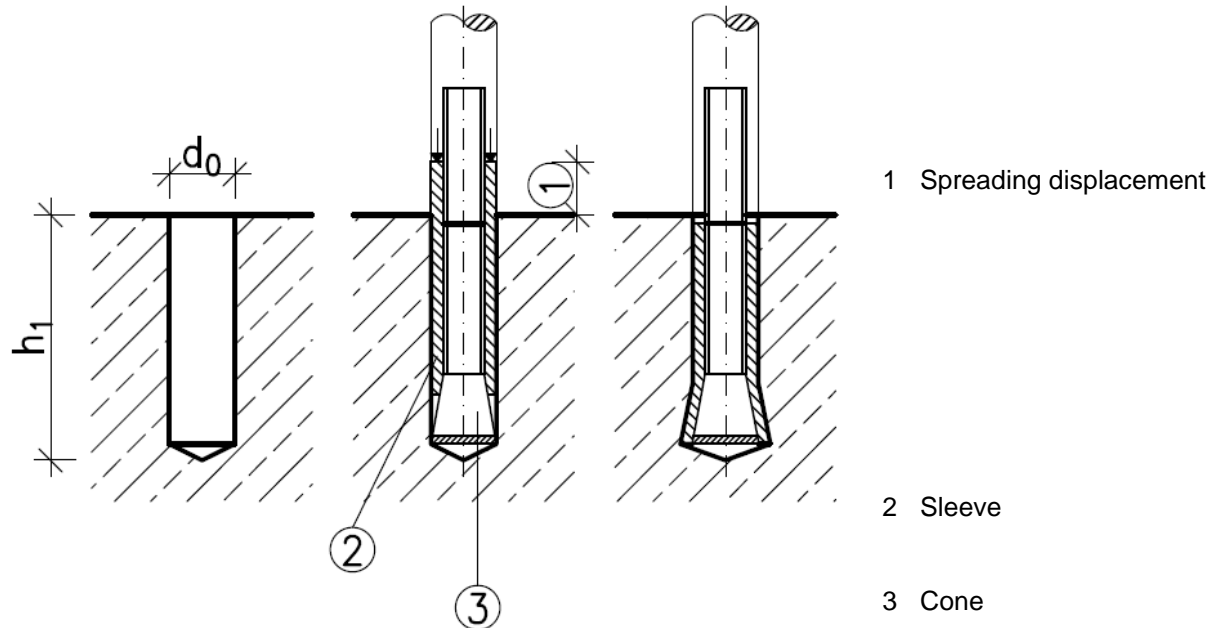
Fastener installation by hammering the sleeve over the cone; e.g., by using a drilling machine
